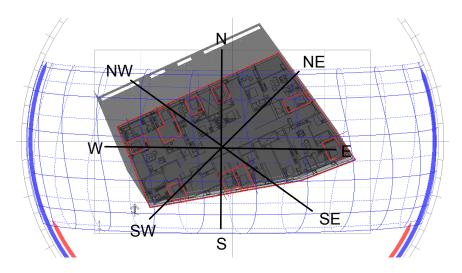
b Typical floor plan Solar penetration on 21 December
